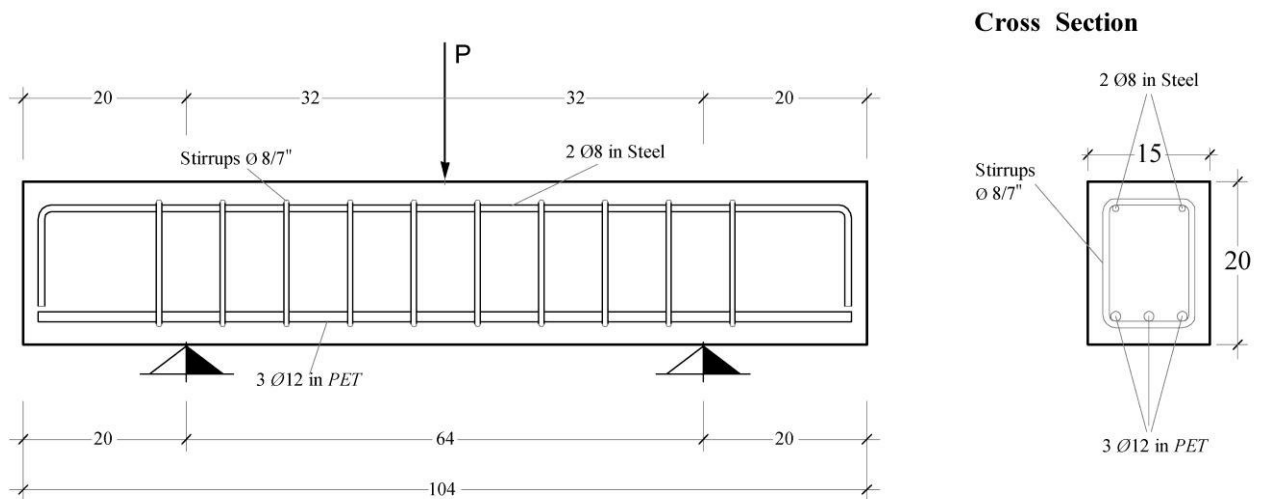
Longitudinal and cross-section of the specimen reinforced with PET bars.
